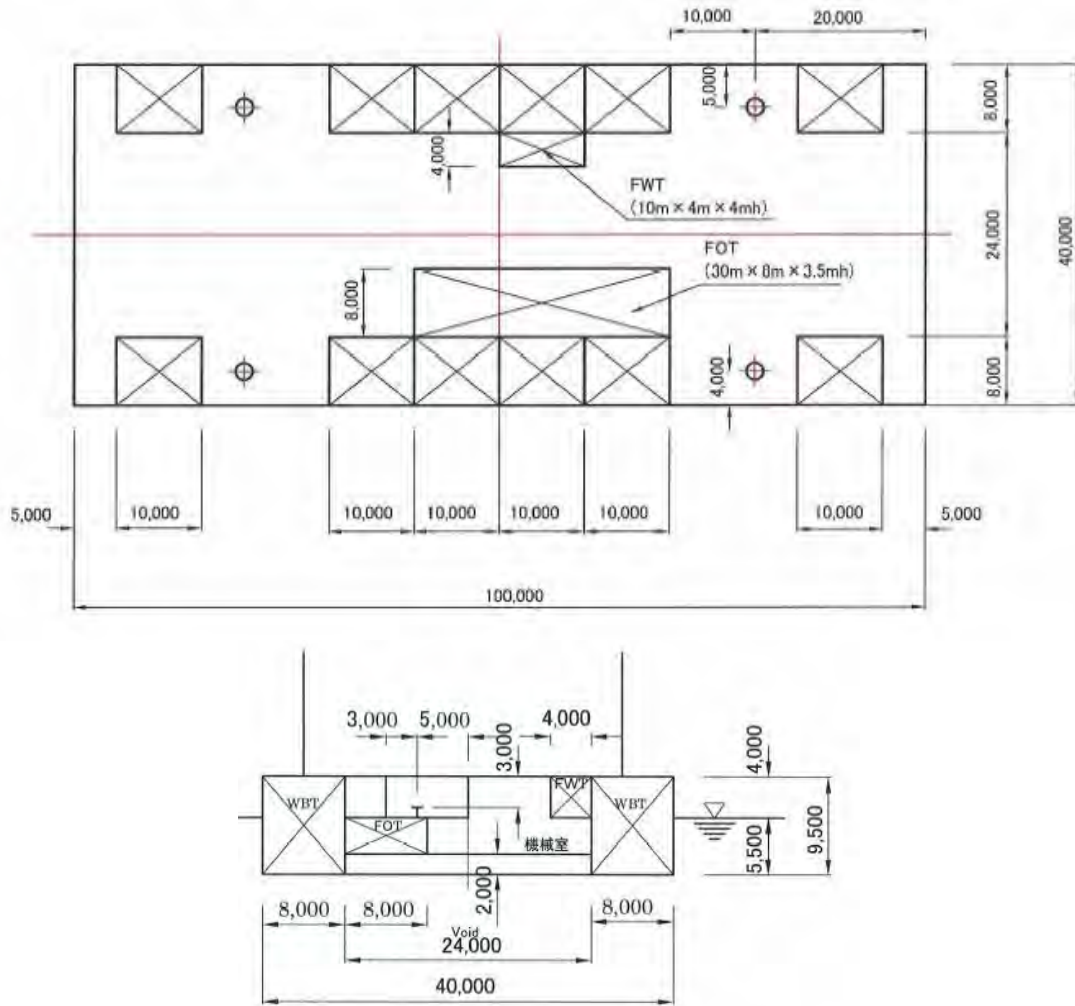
Illustration of Ballast Tanks Arrangement
